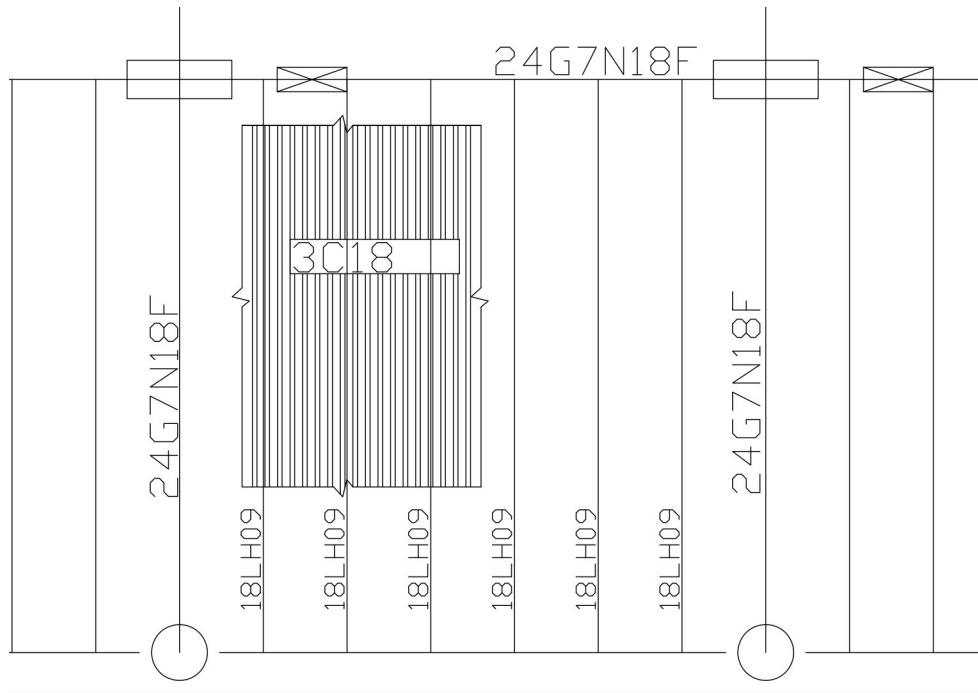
Floor Plan of Steel decking, joists and joist girder
